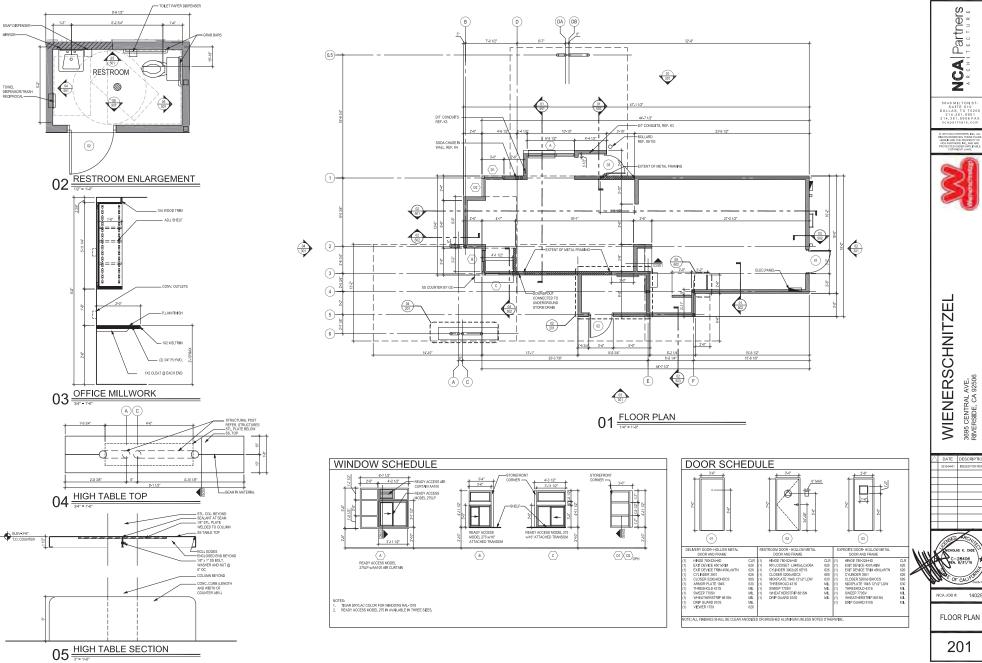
P15-0068, -0175, -0176, -0399, -0400, Floor Plan
